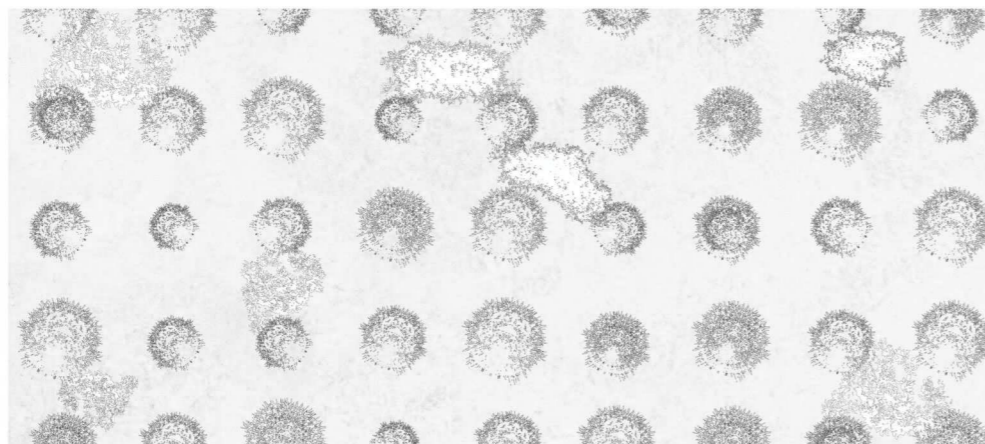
Plan, Y5 (Scale 1:200 - A3)
